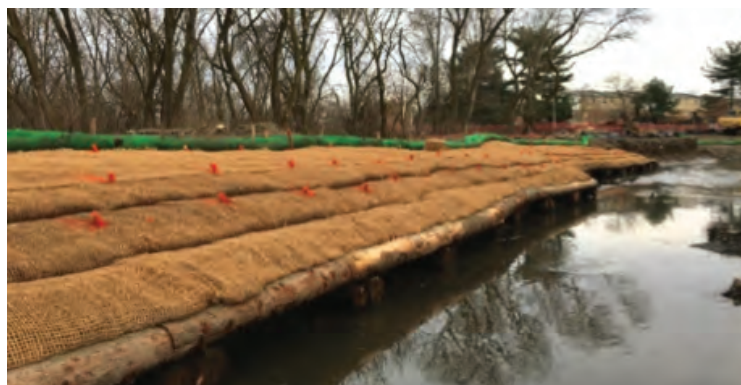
US EPA provided photo of Mudsill during its construction along Darby Creek. Figure 3. US EPA provided photo of Mudsill after restoration planting has had time to grow.
